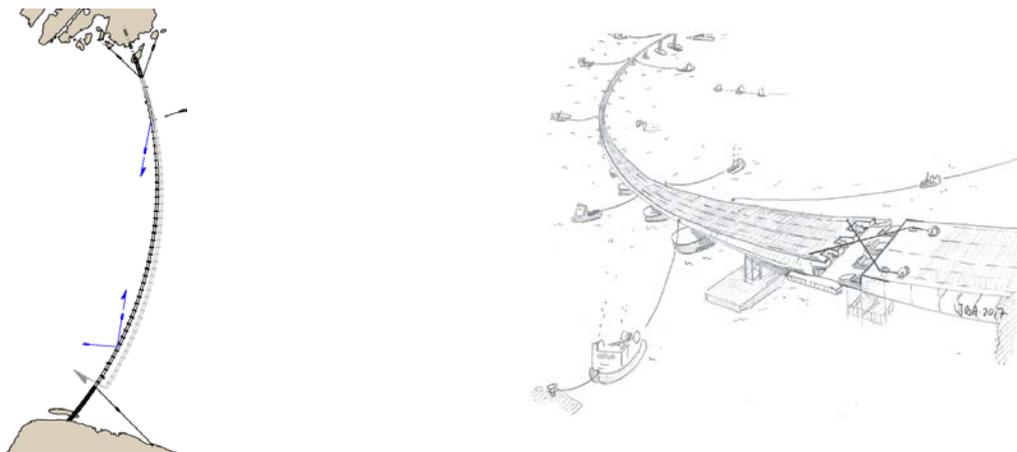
Final positioning of 4400 m bridge segment and bumper and guide system
